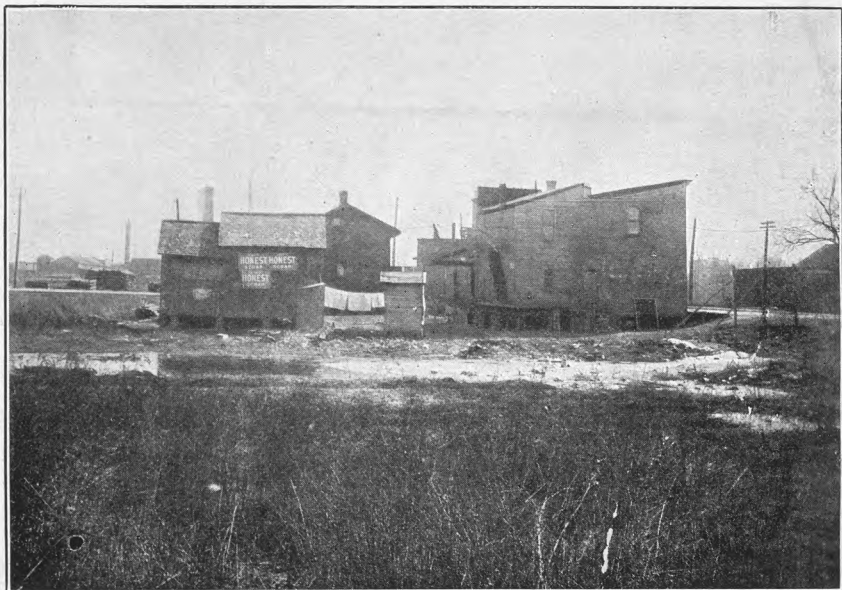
PLATE XV.—FRAME BUILDINGS ON WOODEN PILES.
